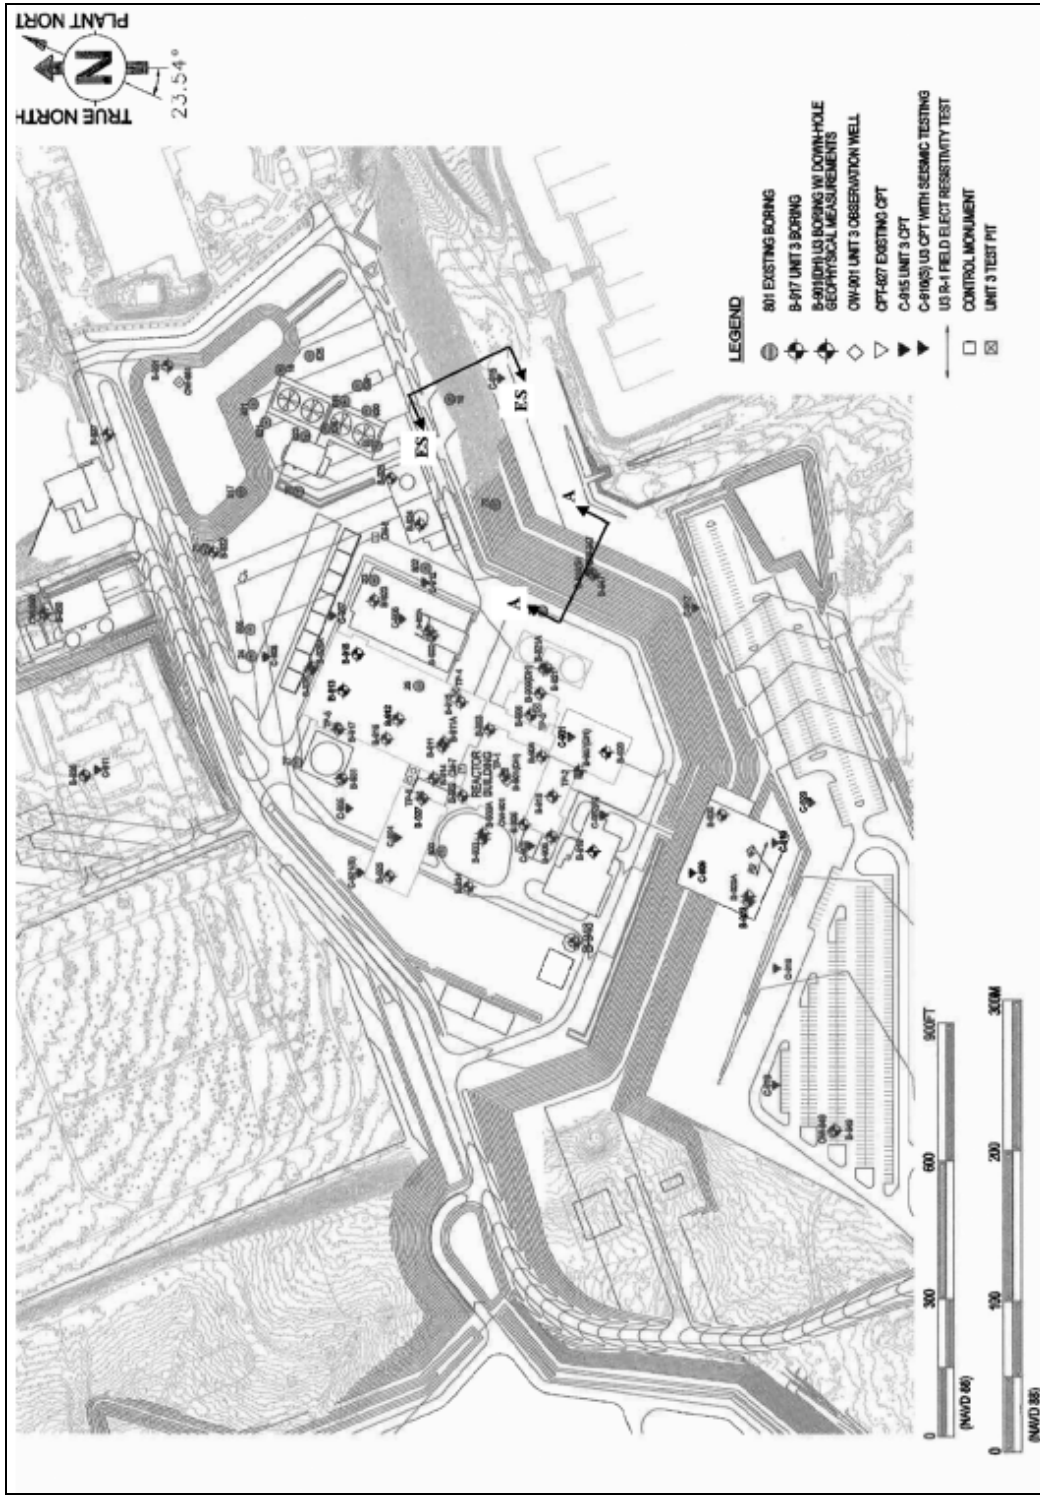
Excavation Grading Plan with Boring Locations (FSAR Figure 2.5-255)
